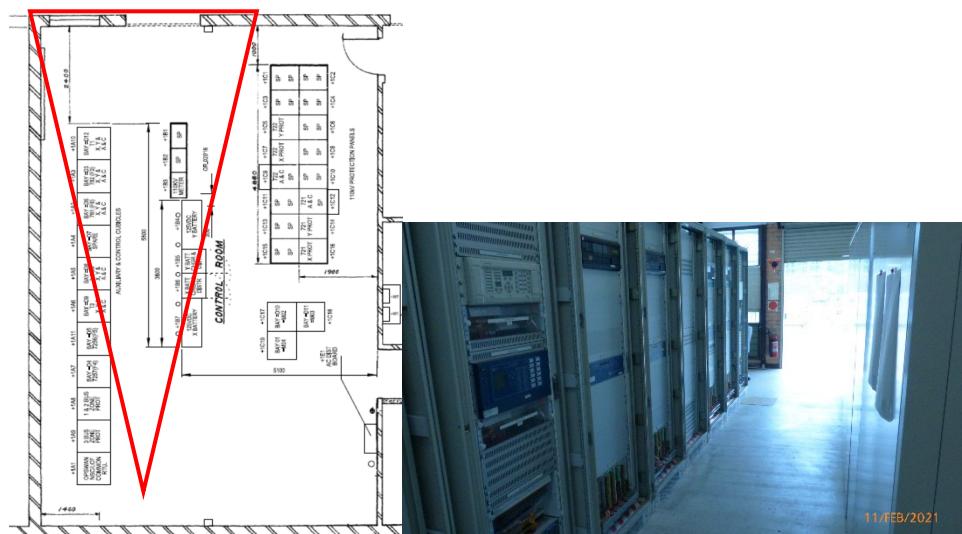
Substation Secondary Systems Building +1 Internal View 4.
